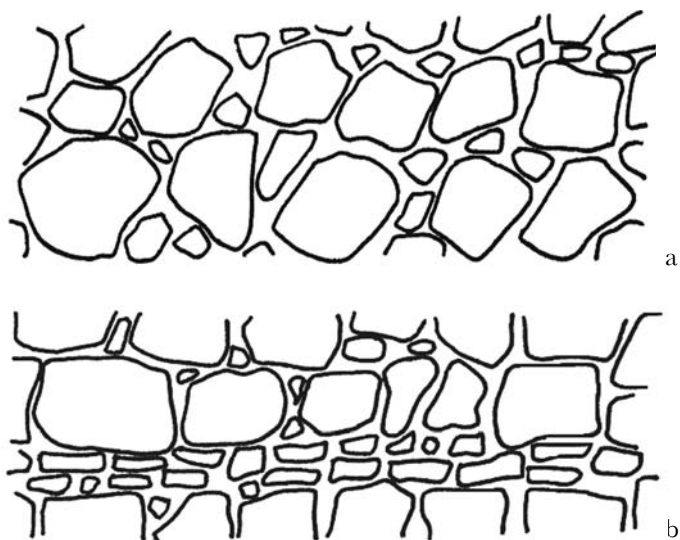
a) Typical Iron Age wall construction drawing; b) Typical Umayyad wall construction; drawings by M. Beckmann.
